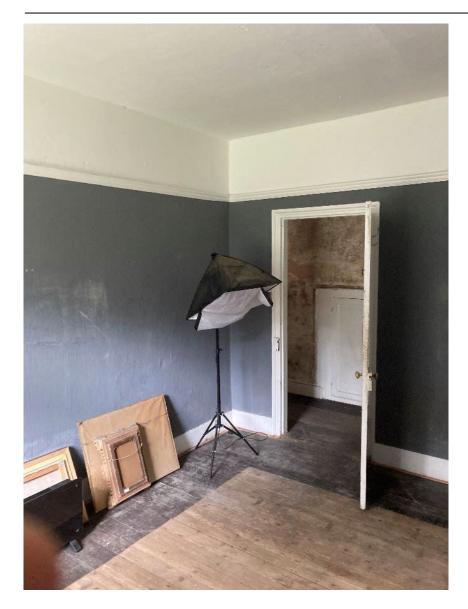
Room 1, new door proposed to be created and doorway blocked but left in-situ
